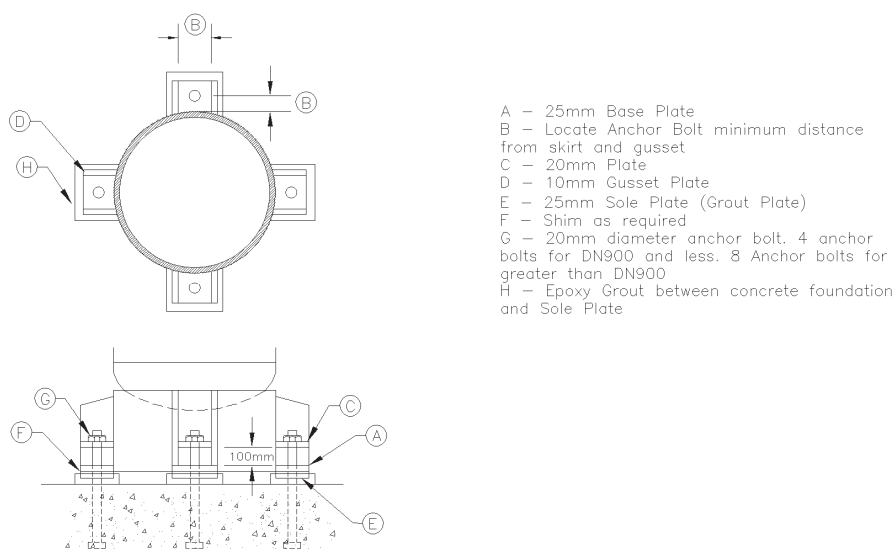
Scrubber Base for Mounting on a Concrete Foundation
